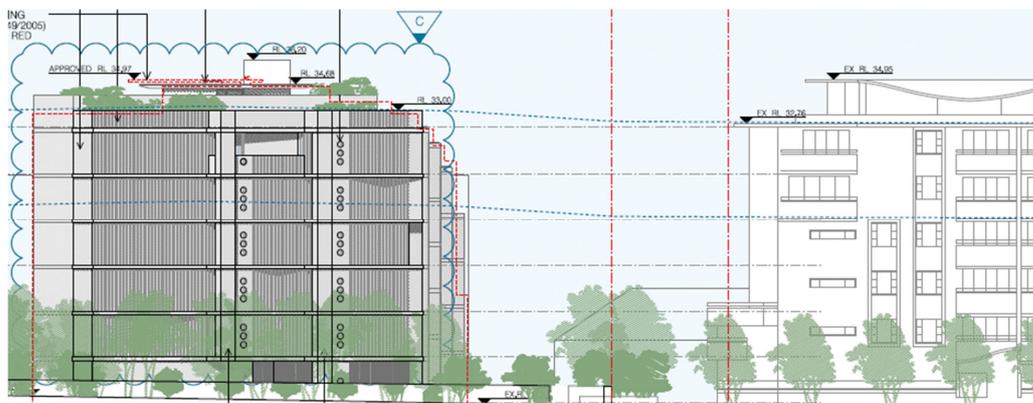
West elevation – originally approved building height shown in red and adjoining RFB 50-54 Ocean Parade (right)
